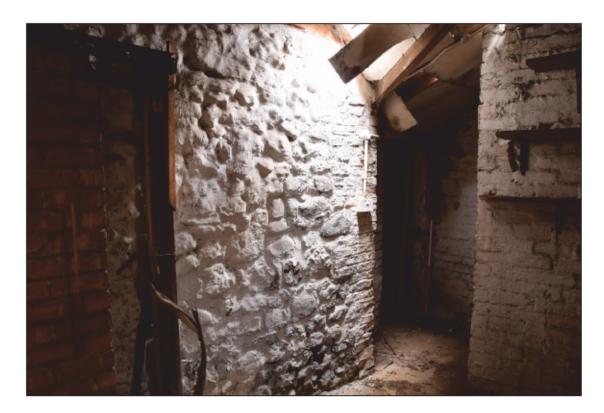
Doors to the older workshop sheds seen from the later concrete structure. A view looking north
